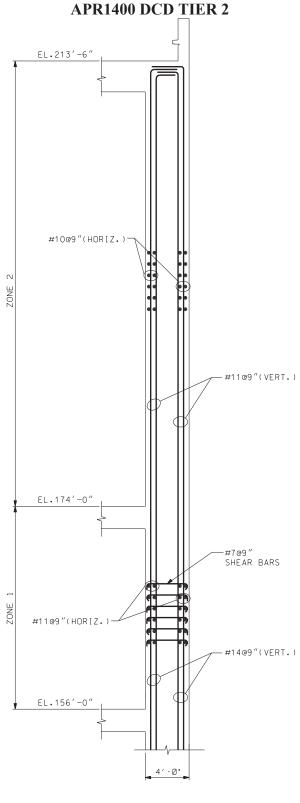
A-45 Reinforcement Arrangement of the AB SFP Wall
